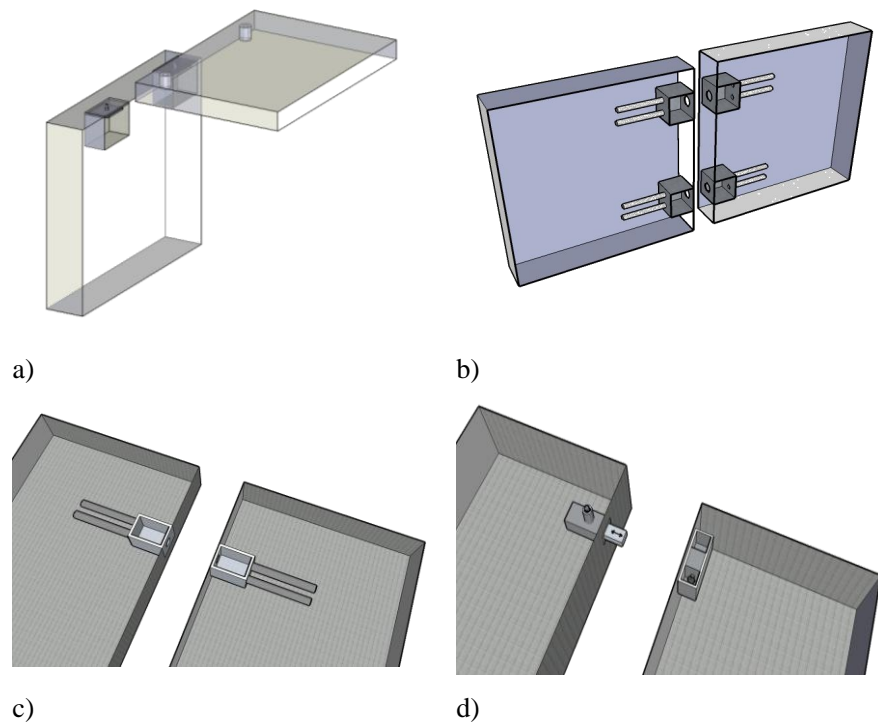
Connection concept 1 a) wall-to-floor b) wall-to-wall c) floor-to-floor d) floor-to-floor, in case of big shear forces.
